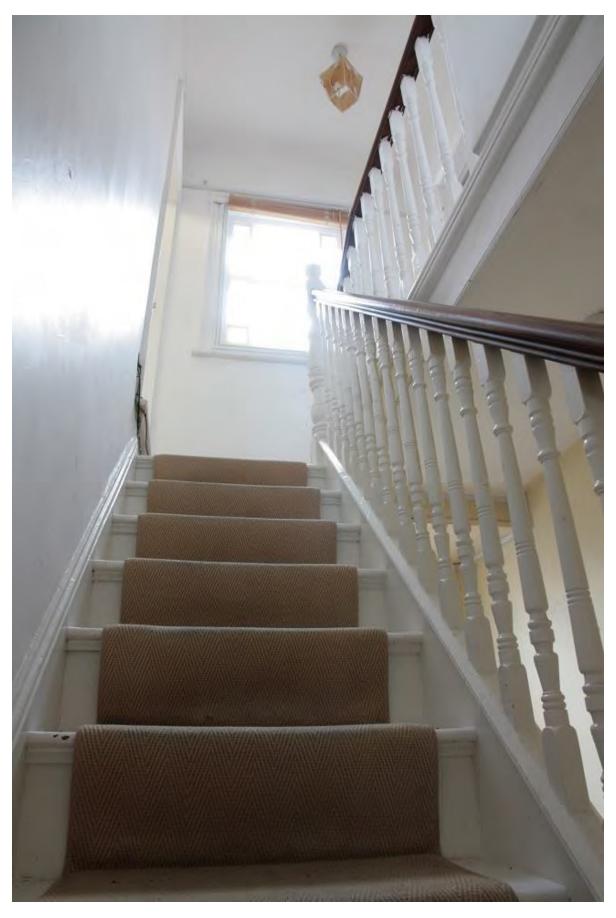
Staircase viewed from ground floor, looking southeast (LMSC16 D100 (71))
